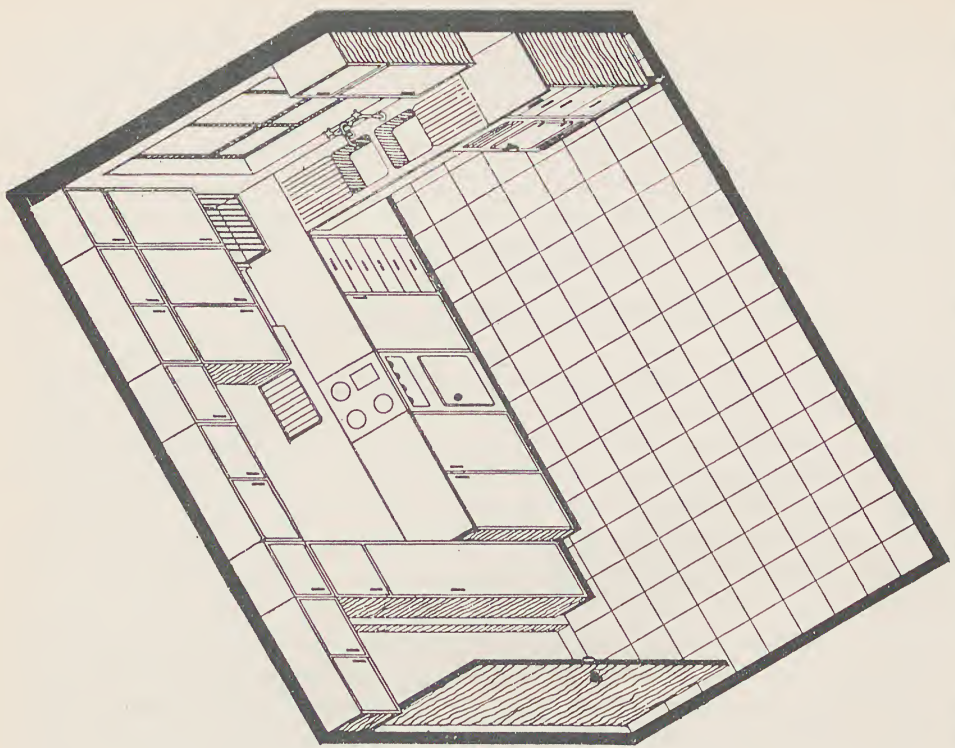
The E]MA range of kitchen units is designed to give a work top 3 feet high, wall cupboards 13 or 18 inches above this top, with dead storage space above to make up the remaining ceiling height. Large or small, new or old, any kitchen can be equipped with an efficient and unified arrangement.
